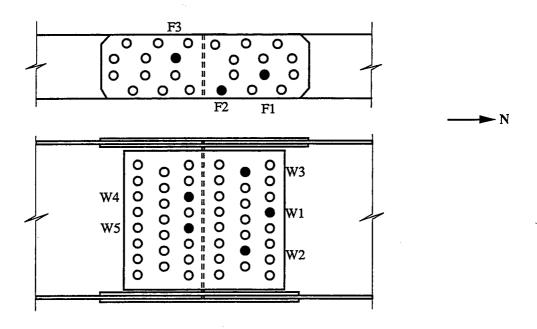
(b) Location of sampled bolts in connection N3 of bridge B1
